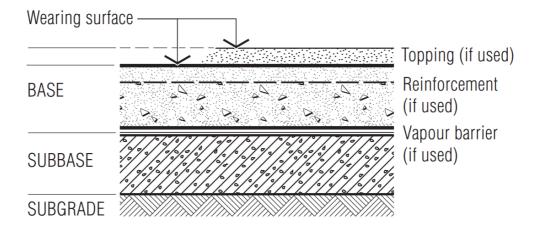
Elements of a typical concrete industrial floor/pavement [4]
